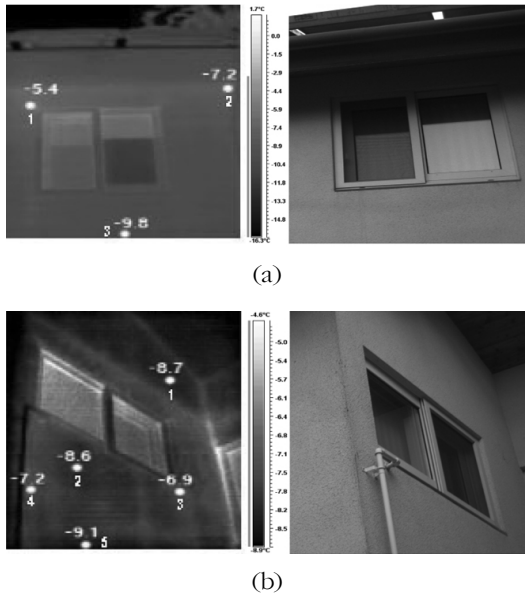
IR images of outside walls (a) wall in the South and (b) wall in the West.
